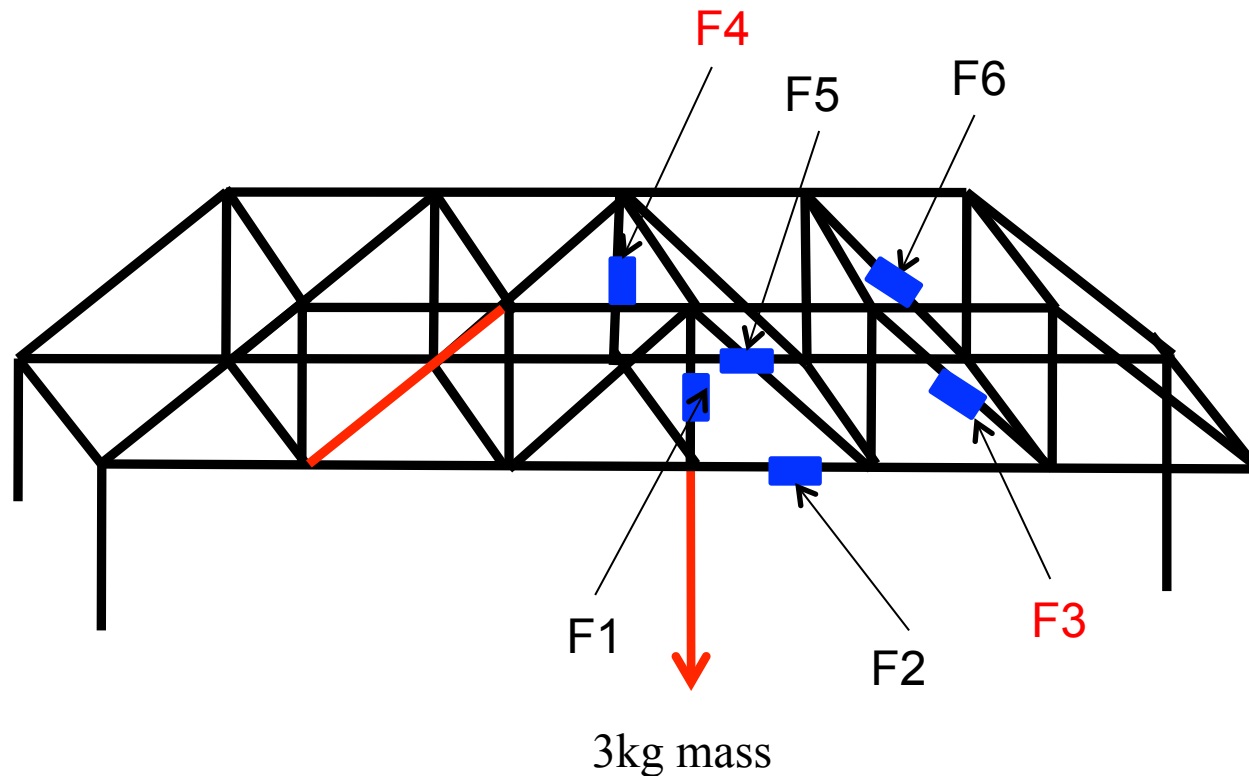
Physical Experiment: Loaded damaged truss bridge-Force sensor 4 (F4)
